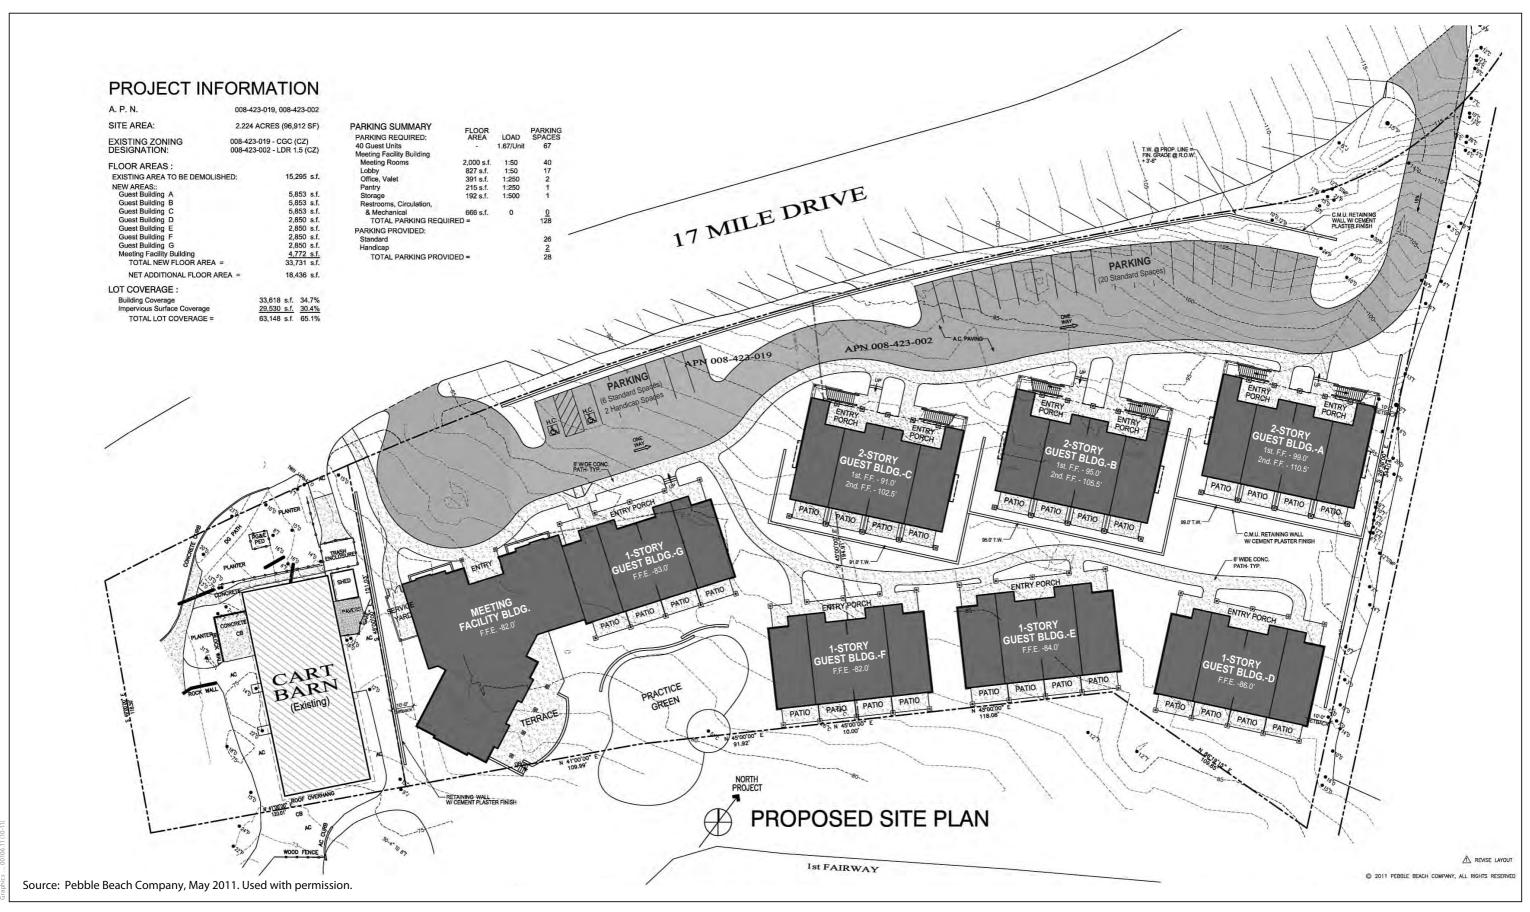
Fairway One Reconstruction at The Lodge at Pebble Beach
